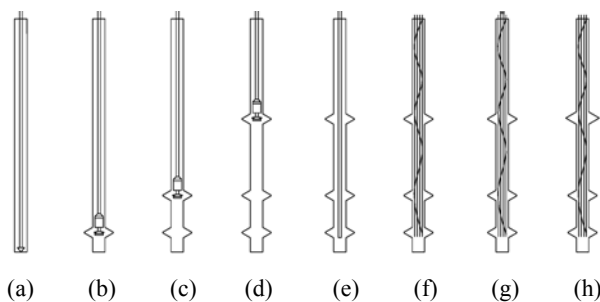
Sketch of construction progress of squeezed branch and plate pile
